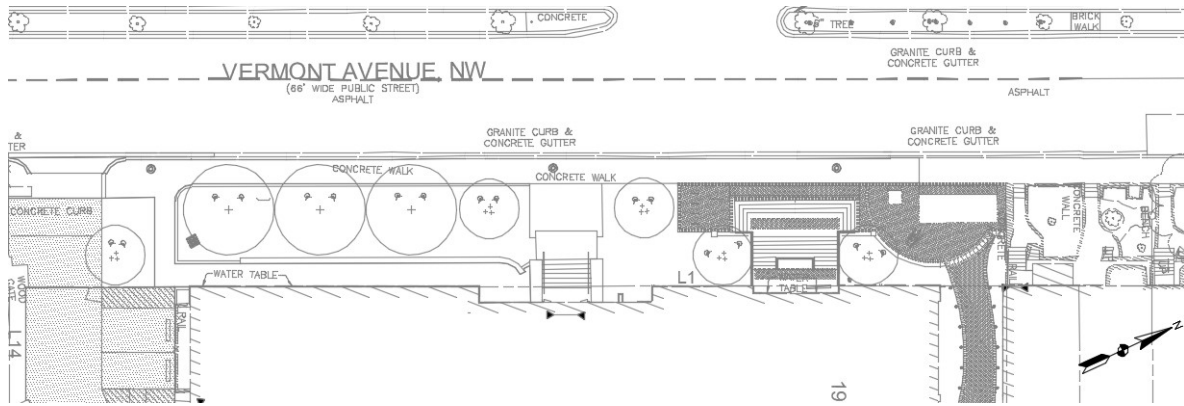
“Existing Conditions” Site Plan (Under Construction)
